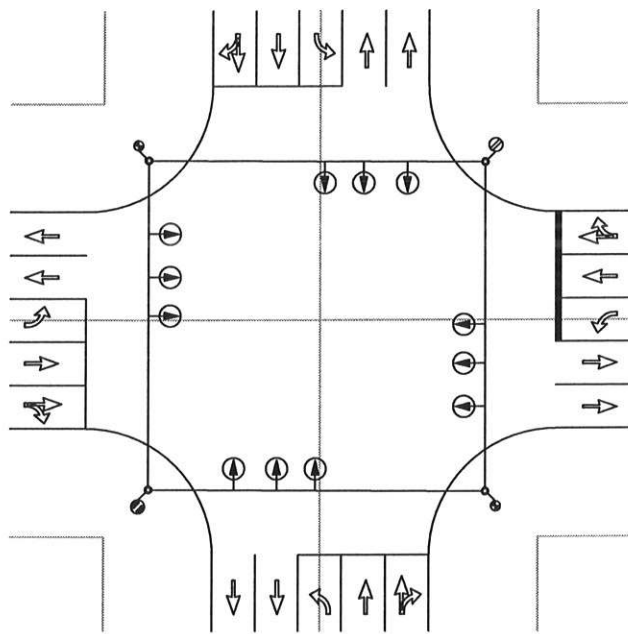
DETAIL : C | INSTALLATION OF BOX SPAN WIRE T.S. FYA AND DOGHOUSE ON STEEL OR WOOD POLES
